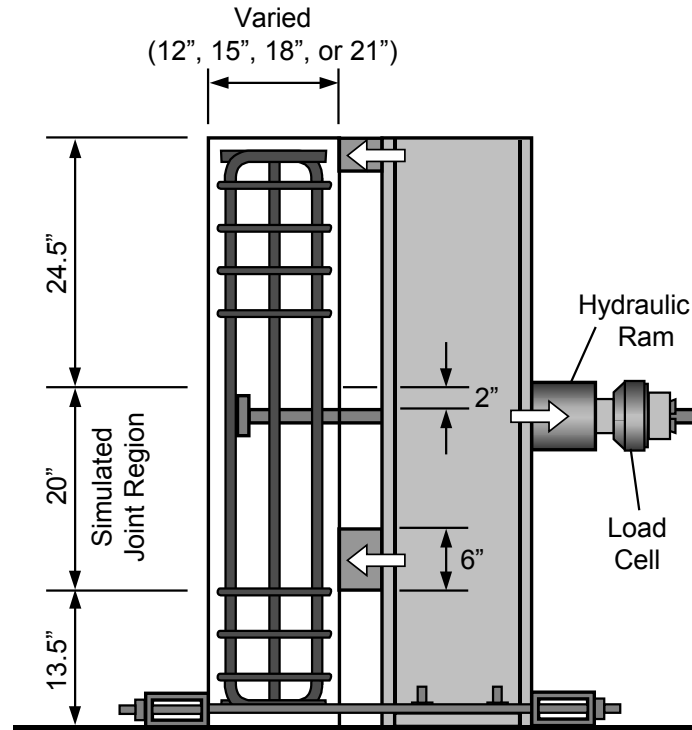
Typical exterior beam-column joint studied by Bashandy
